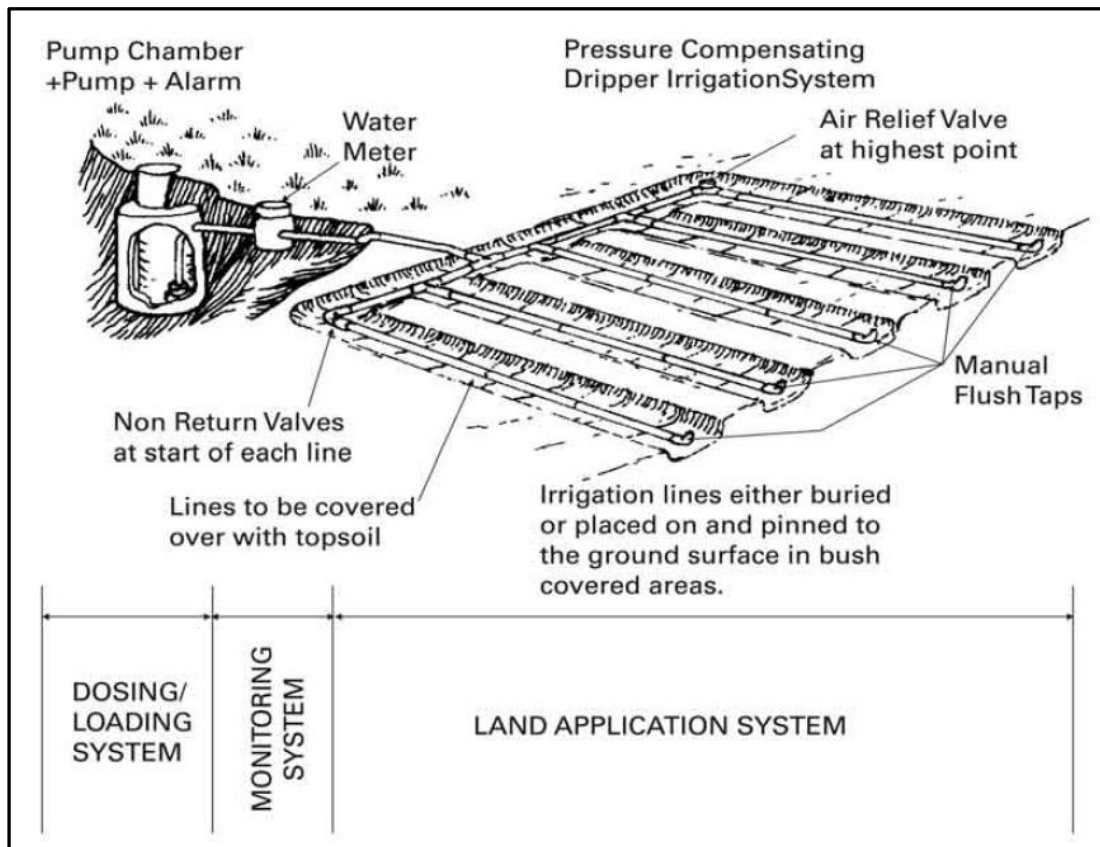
Shallow Drip Irrigation System (TP58 On-site Wastewater Systems 2004)
